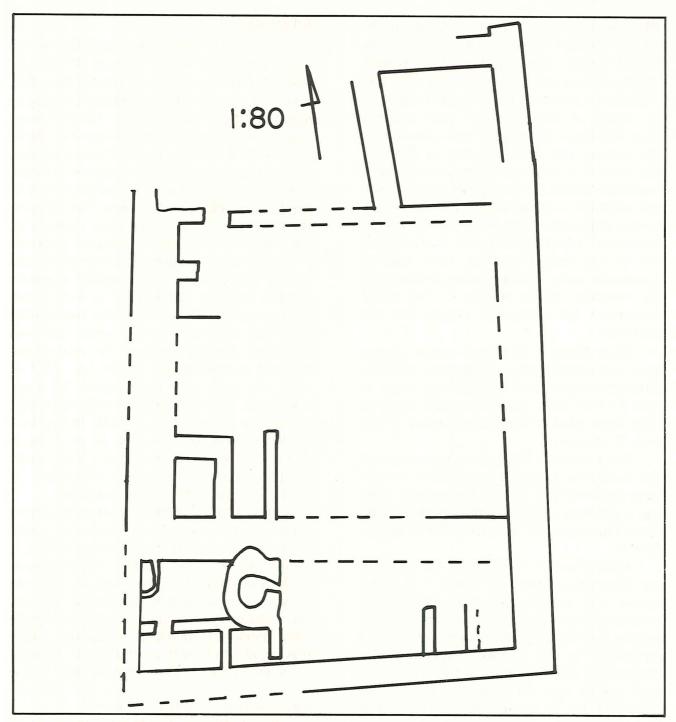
Ed-Dreijat: Sketch plan of the architecture.
